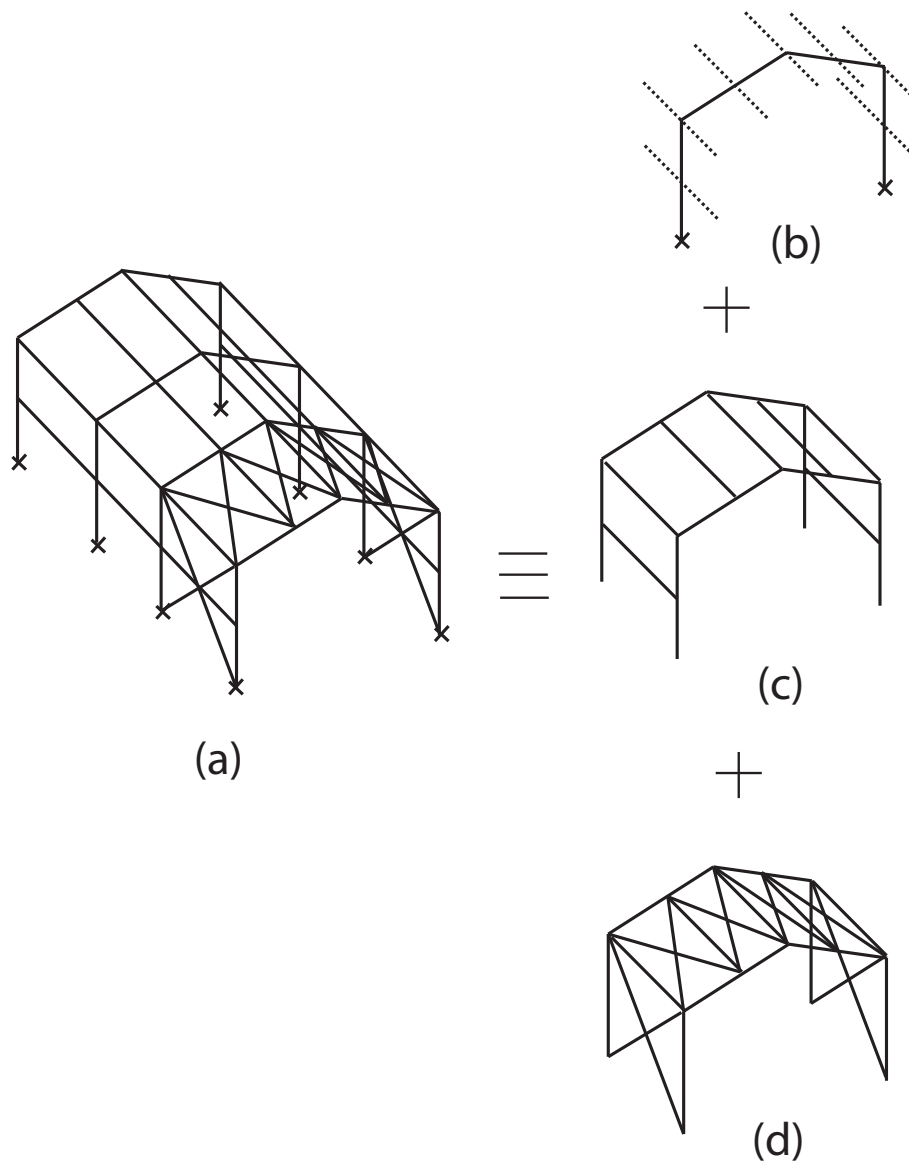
Reduction of a 3D frame into simpler forms: (a) 3D frame, (b) 2D rigid frame, (c) 1D beams (purlins and girts), (d) 2D bracing trusses (Trahair, 2008).
